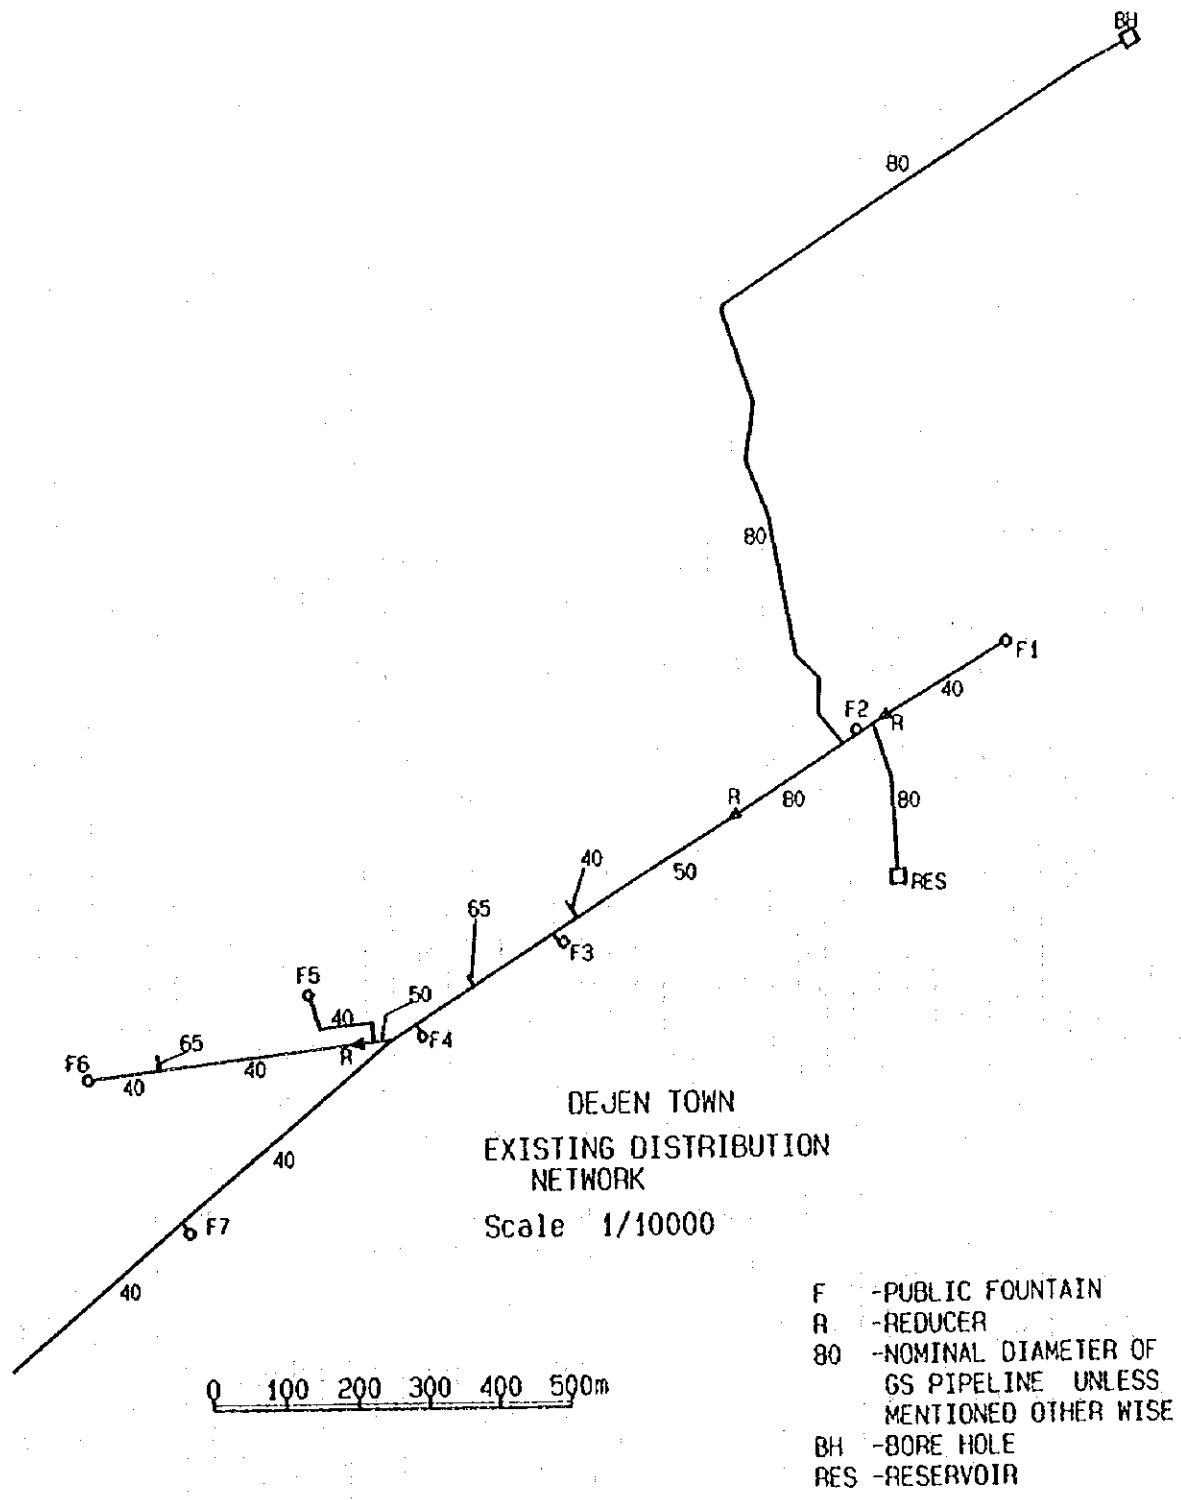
Schematic layout of Existing Facilities (No scale)
